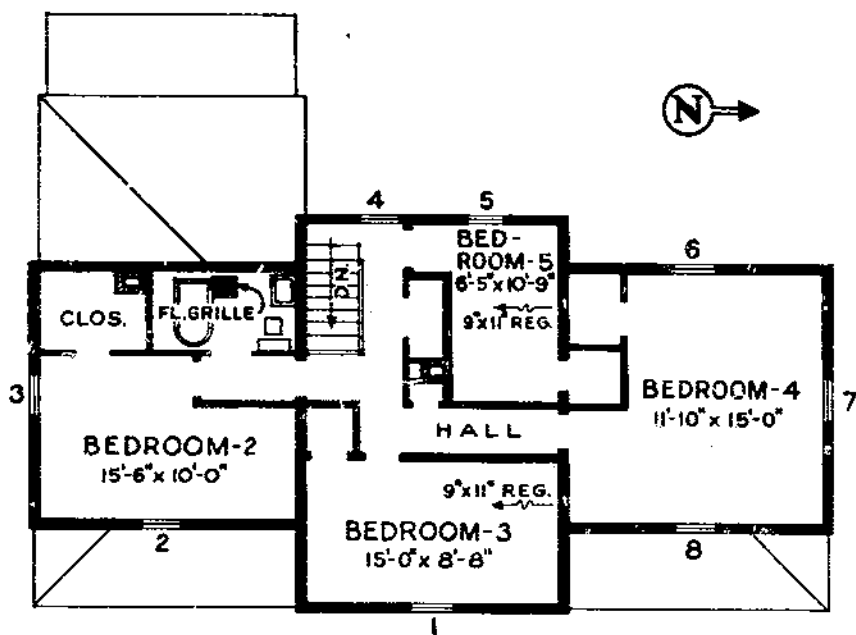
Second-floor plan of house No. 3, showing location of warm-air registers and cold-air returns.
